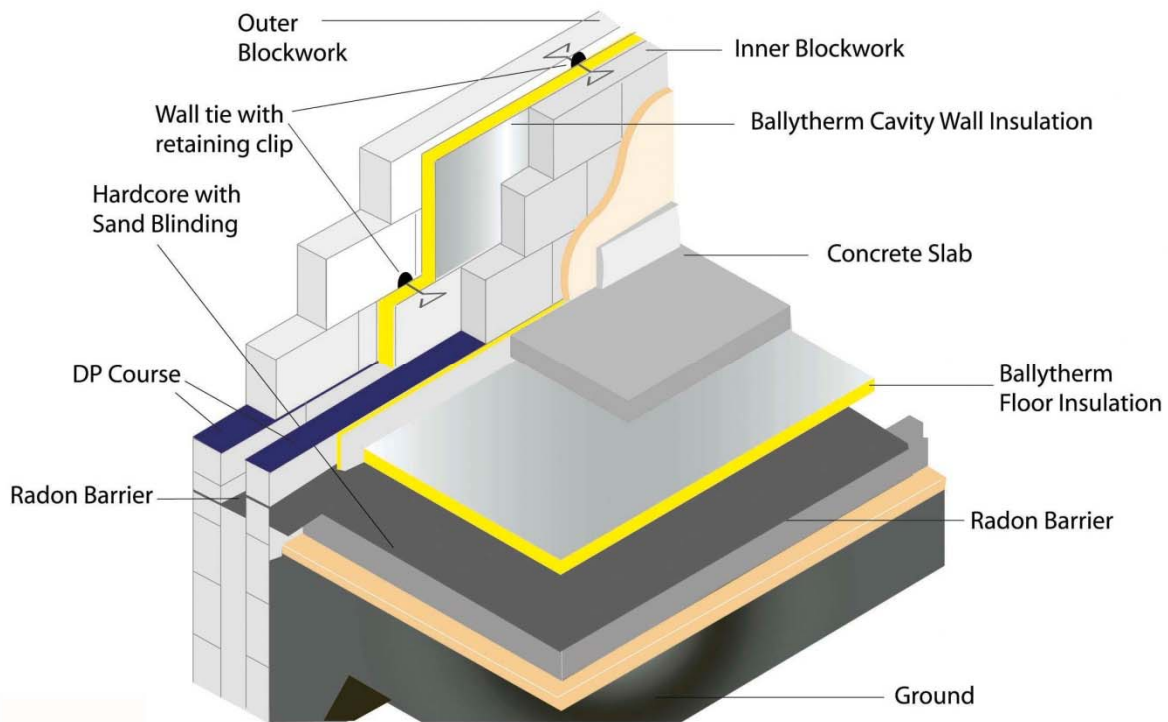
Ballytherm BTF Floor Insulation below floor slab
